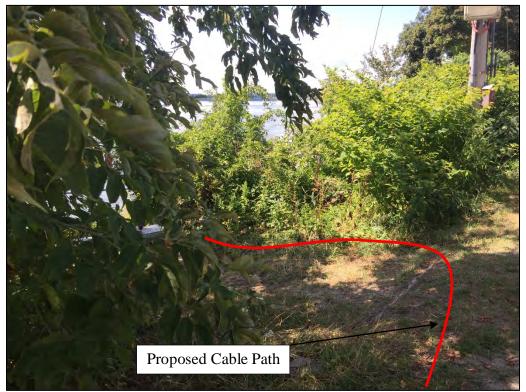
Peaks Island facing west towards existing riser pole. Cable will be buried along the slope, towards the beach.
